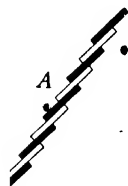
ELEVATION OF OPEN SLATING ROOF
